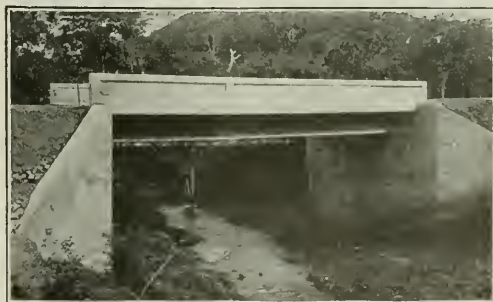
TYPICAL REINFORCED-CONCRETE GIRDER SPAN ON NEW WORK
